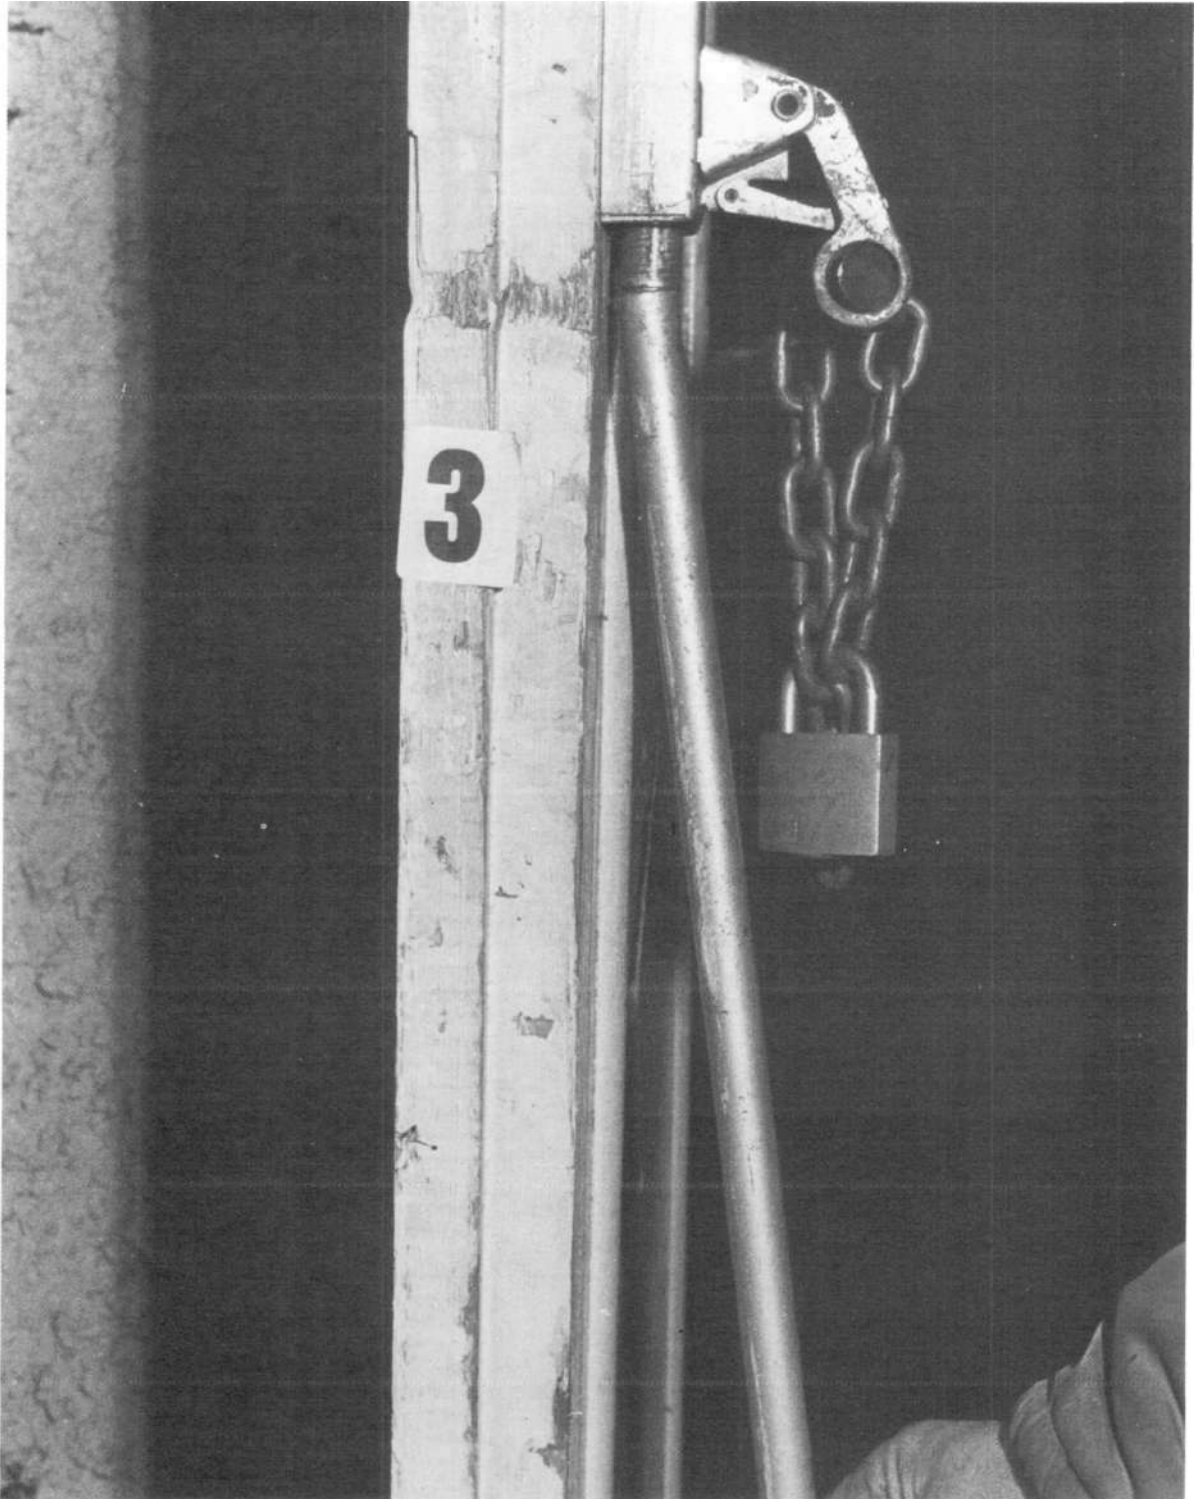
View of the right-hand door of outer Exit 3, showing vertical bar bent inwards and lock and chain hanging from horizontal bar.
